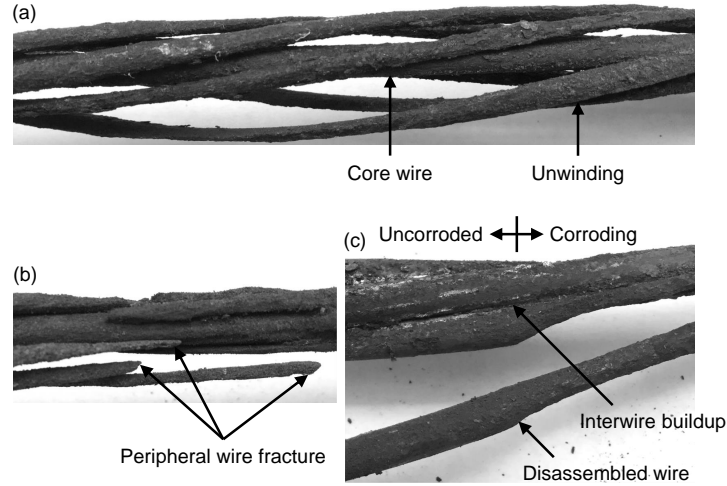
Post-corrosion inspection of unloaded strand: (a) unwinding of peripheral wires, (b) fractured wires, and (c) interwire buildup of corrosion products near fracture point. Core wire diameter (5.20 mm) found to be nearly the same as before corrosion (5.22 mm).
